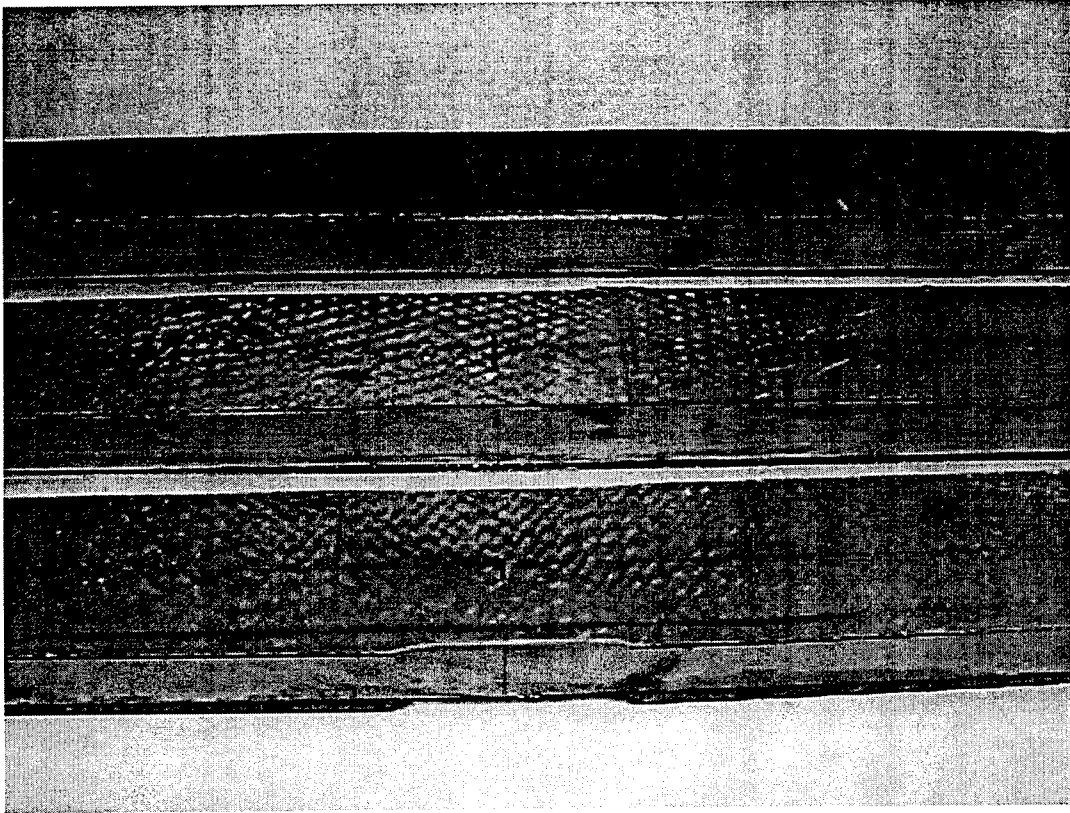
Stacked 2x2's Reinforced with Fiberglass Shear Plates
